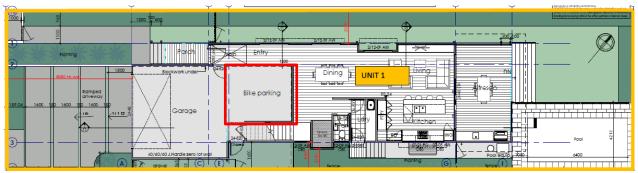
Approved Ground Floor Plan (MCU18/0003)
